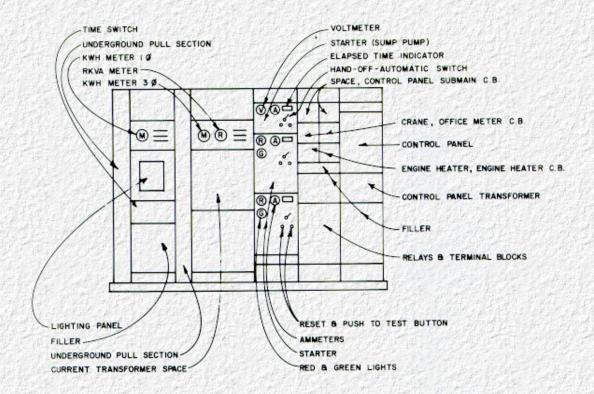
Man Switchboard Layout: Typical Layout for Switchboard Serving One Electric Sump Pump, 2 Main Electric Pumps and 2 Engines
